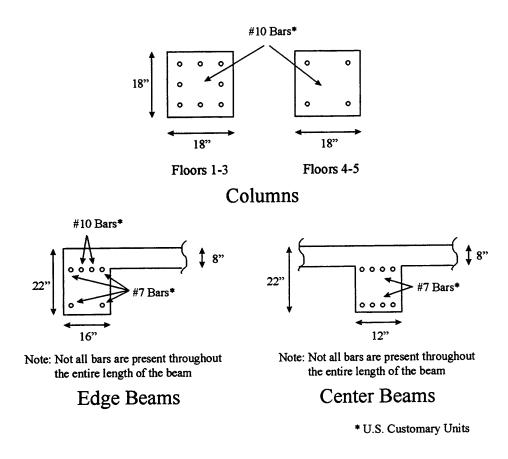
Column and Beam Cross-Sectional Dimensions
